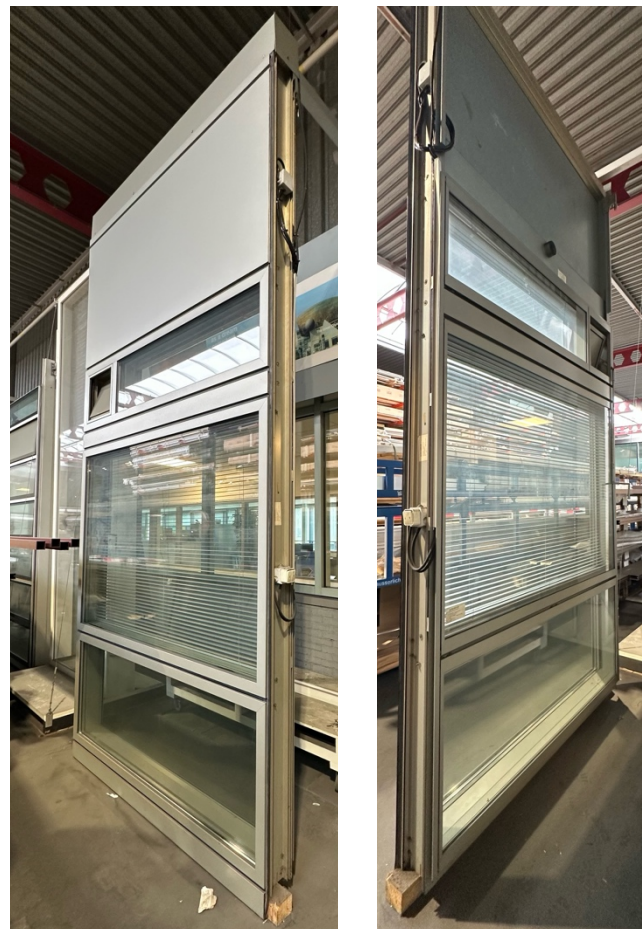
Outer side (left) and inner side (right) facade panel ABN Amro (image by author).
